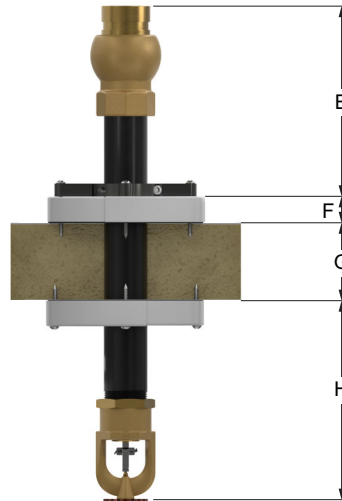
Sprinkler Assembly with Boots and Bracket (VK512 Shown for reference)
